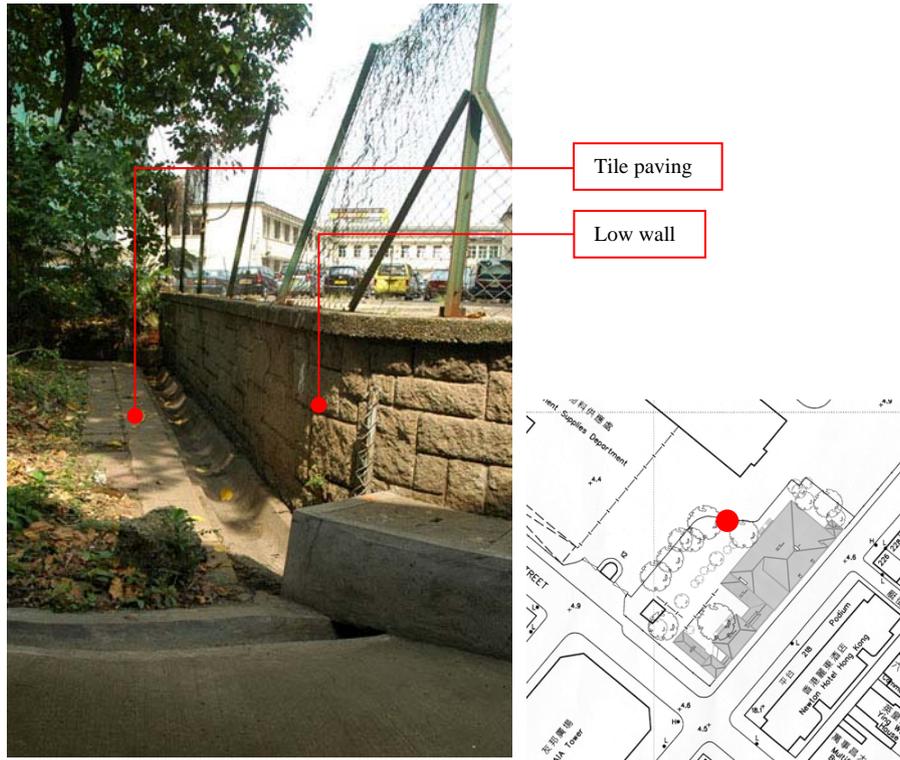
Low wall enclosing the lawn and tiles paving surrounding the lawn.
